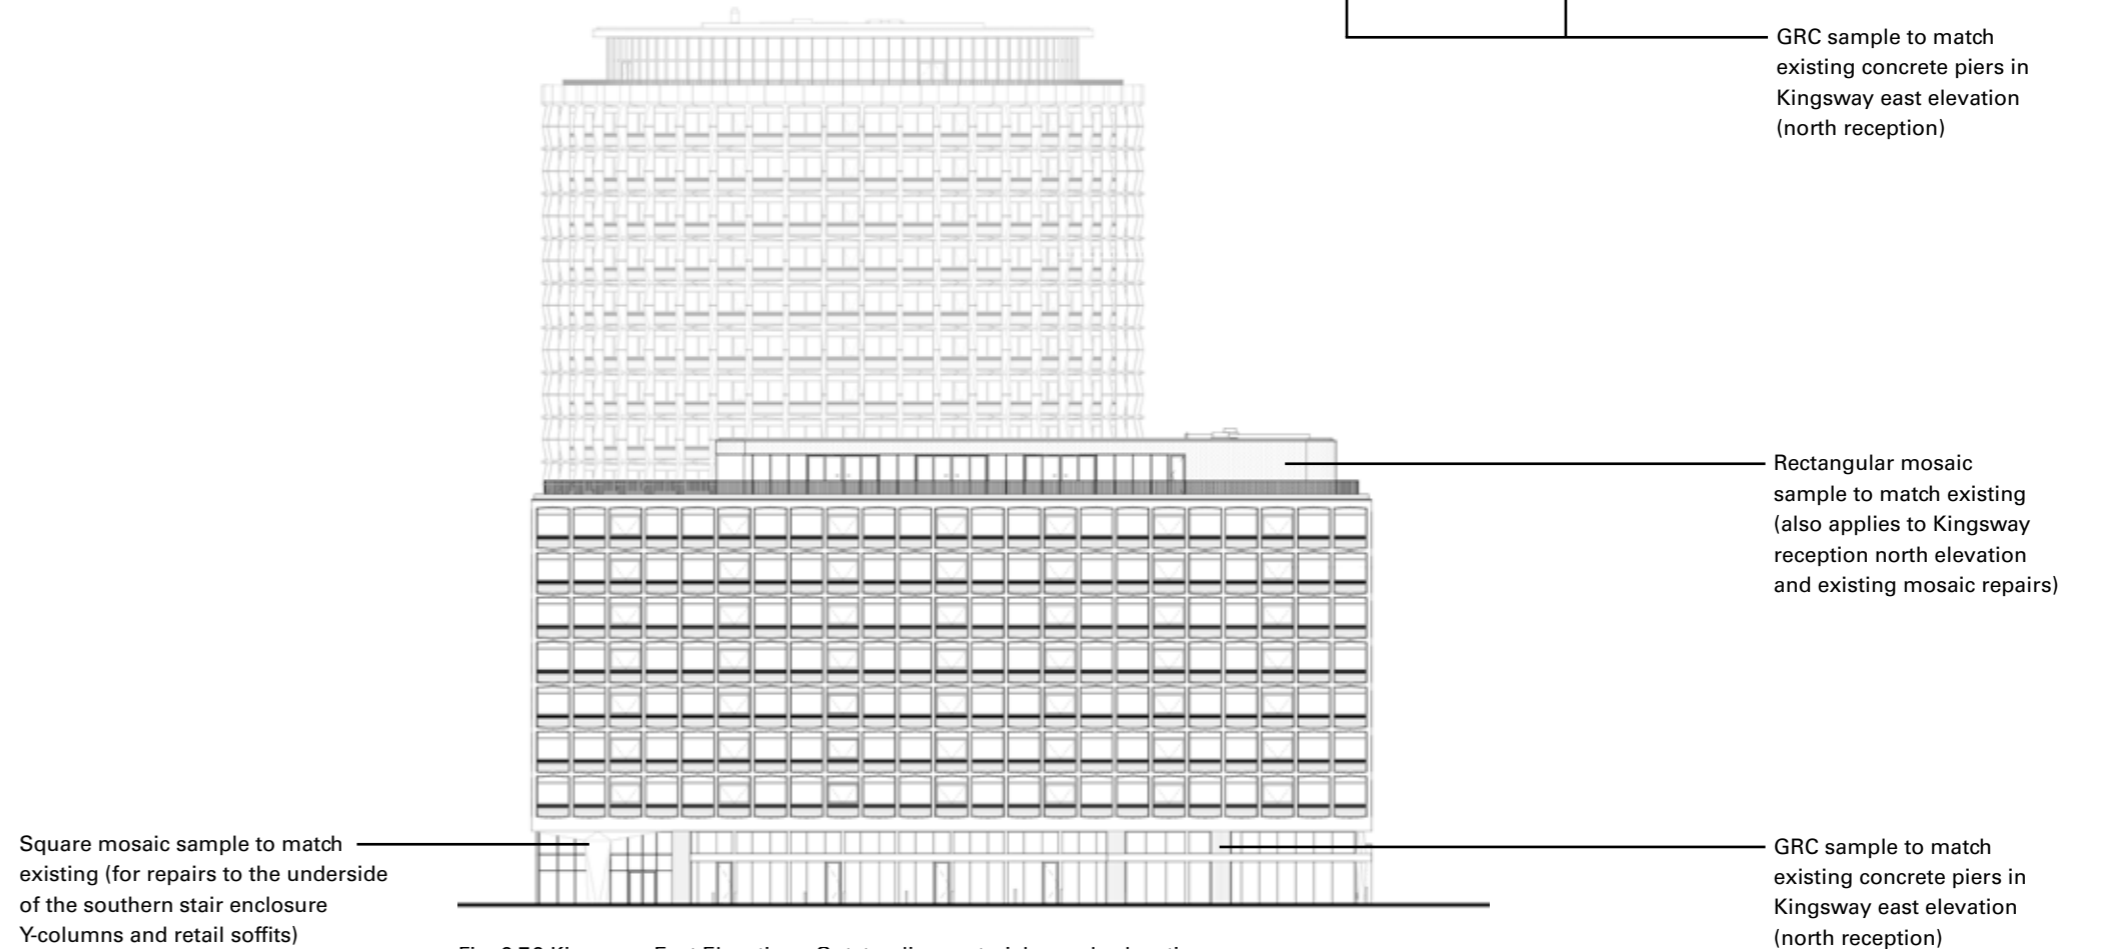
Kingsway East Elevation - Outstanding material samples locations
